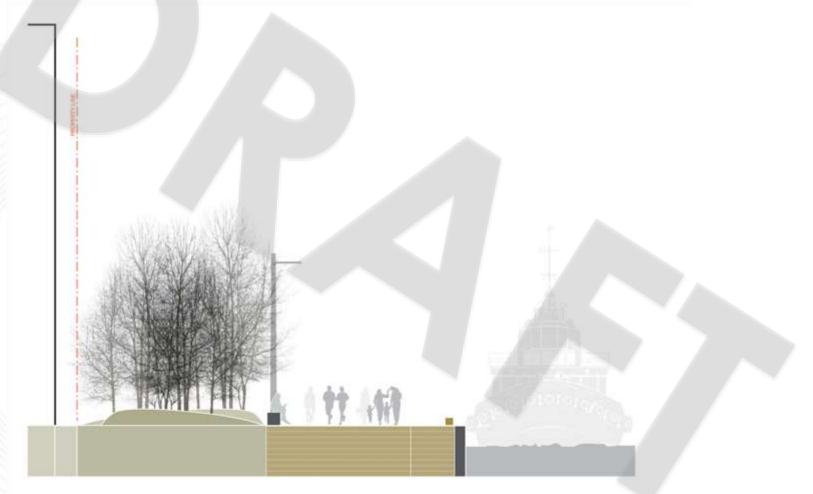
Proposed typical water's edge promenade section facing the Ship Channel.
